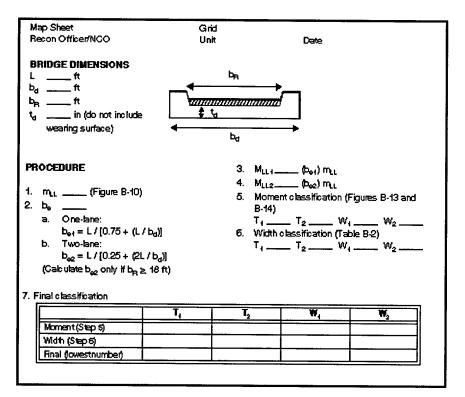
Concrete Slab Bridge With Asphalt Wearing Surface
